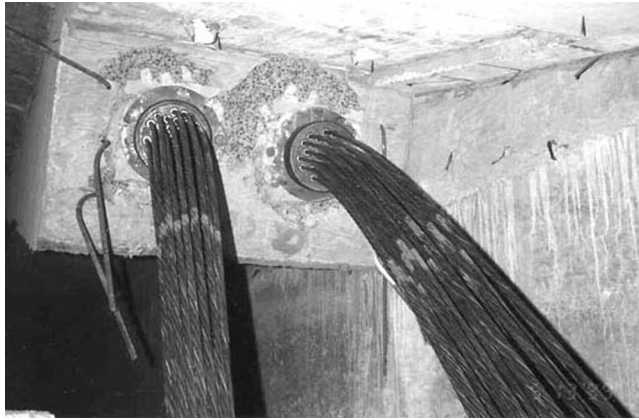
Typical seven-wire prestressing strand (courtesy of HDR Engineering).
